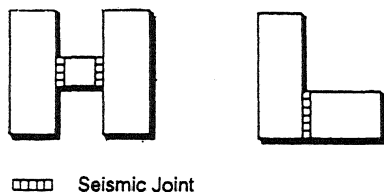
H-shape and L-shape floor plan separated in rectangular blocks
